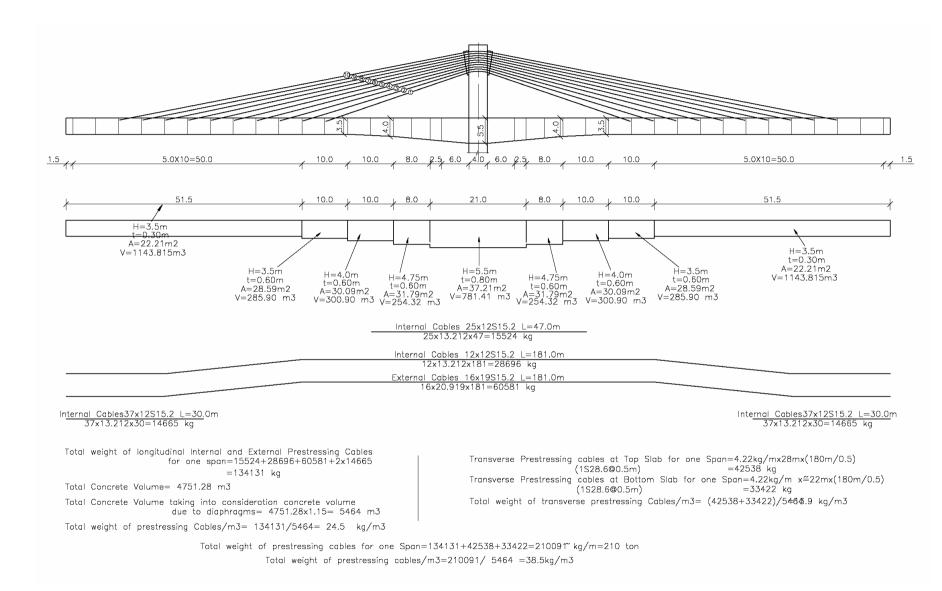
Quantities of Deck Girder (Railway Provision Case)
